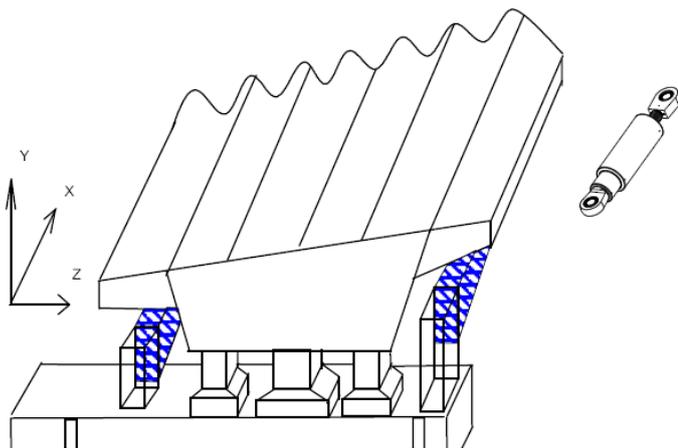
Image of damper installed at girder end and sketch of velocity proportion damper.
